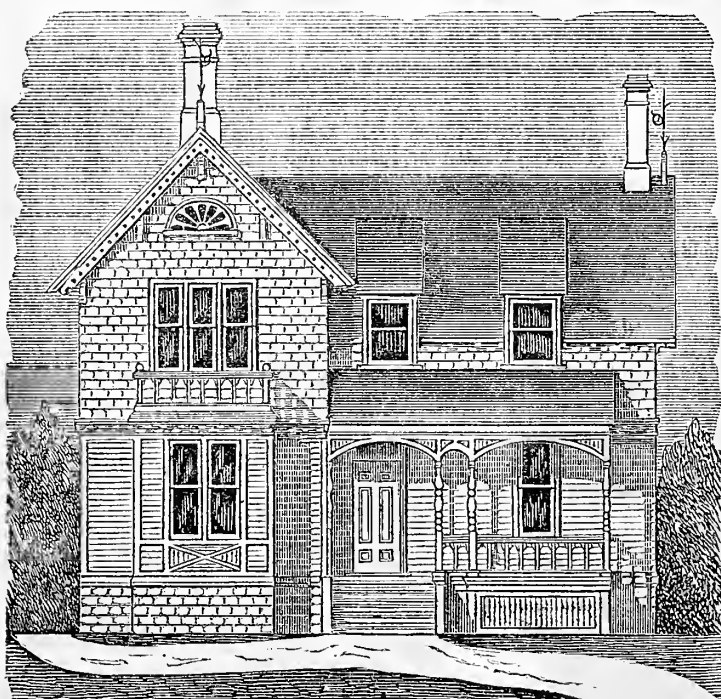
FRONT ELEVATION OF COTTAGE.
